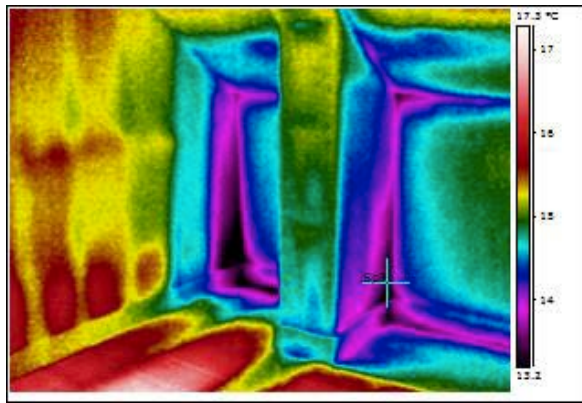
Room S18, attic space. The image shows thermal bridges at the junctions between external wall and structural beam in the second floor.
